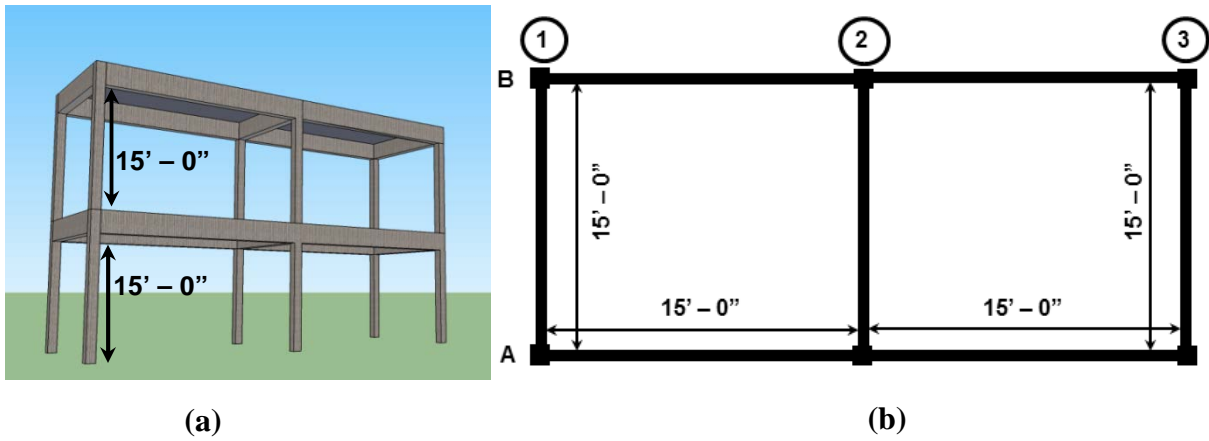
Prototype geometry – (a) elevation view (b) plan view
